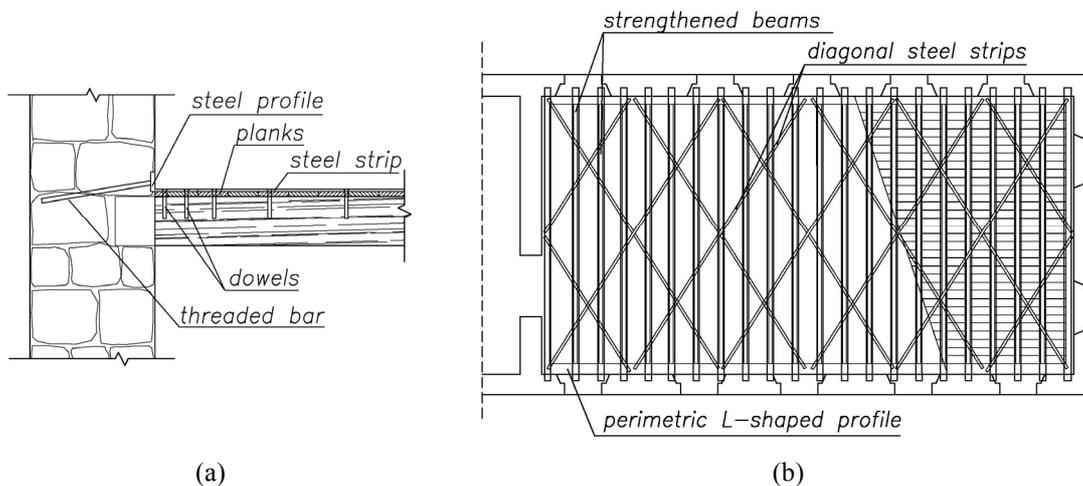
Details of the complete intervention: (a) floor-wall connection, (b) lattice truss system.
